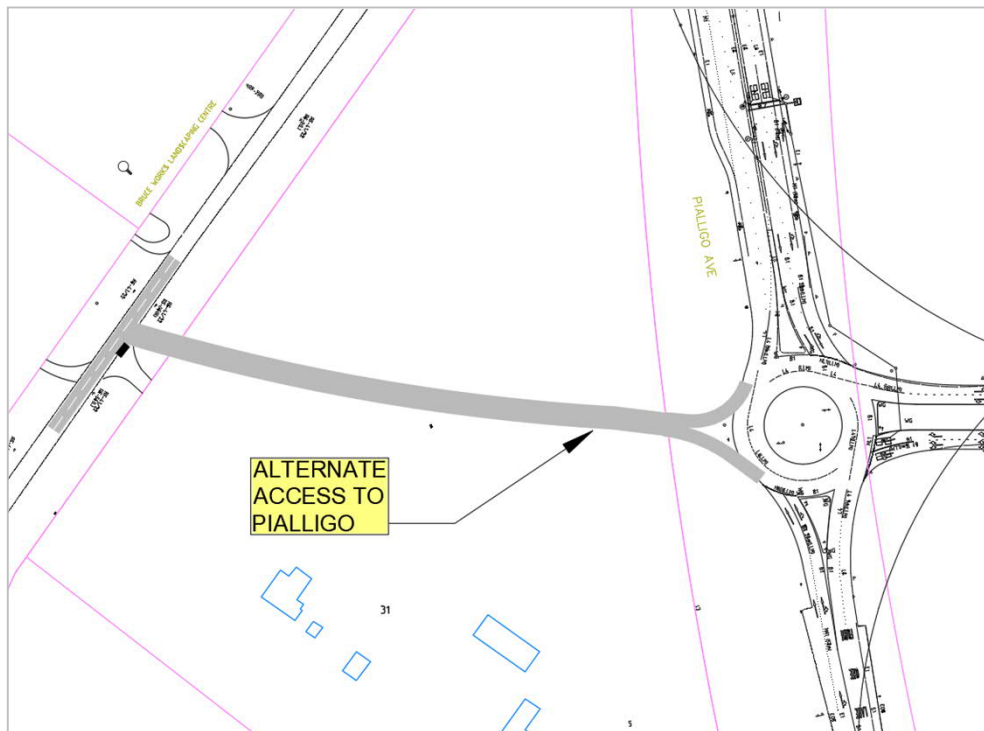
Option 12-2 New link road to Pialligo between Kallaroo Road and the Brindabella Circuit roundabout, including the removal of the Beltana Road link to Pialligo Avenue
